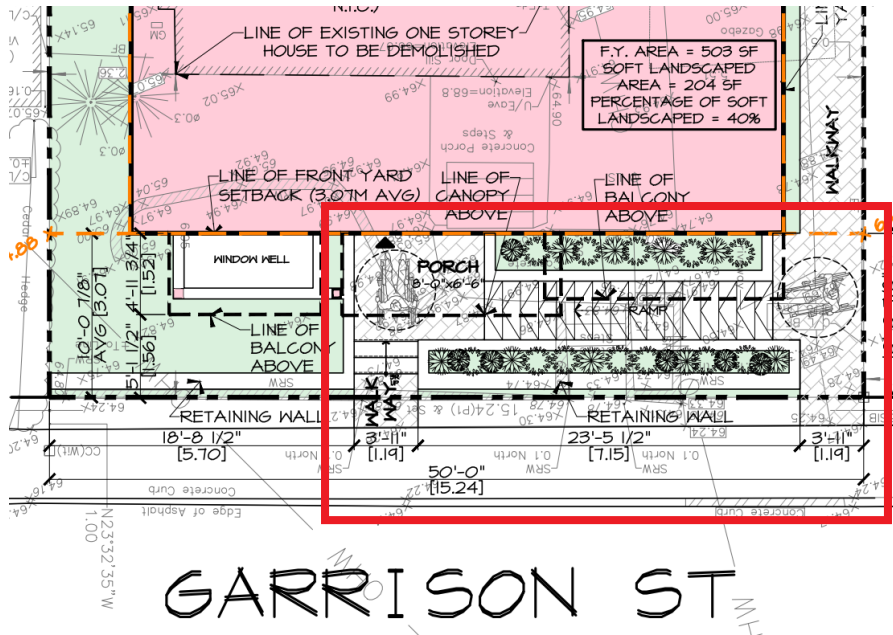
Site Plan Excerpt Illustrating Front Entrance
